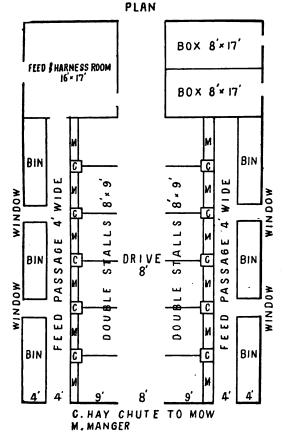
STABLE FOR 25 HORSES (FLOOR PLAN).
